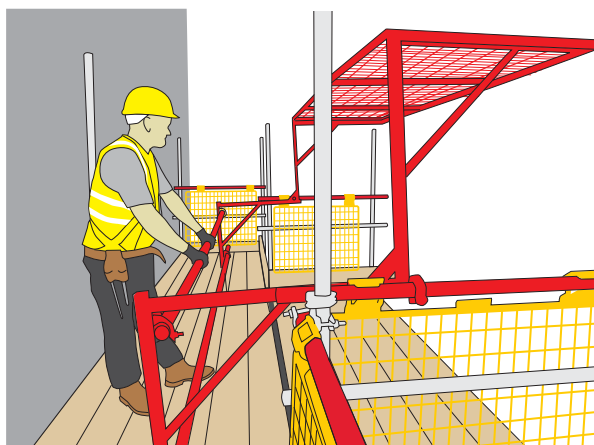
Example of a loading bay gate to maintain collective fall protection for the scaffold users when the loading bay gate is open.
